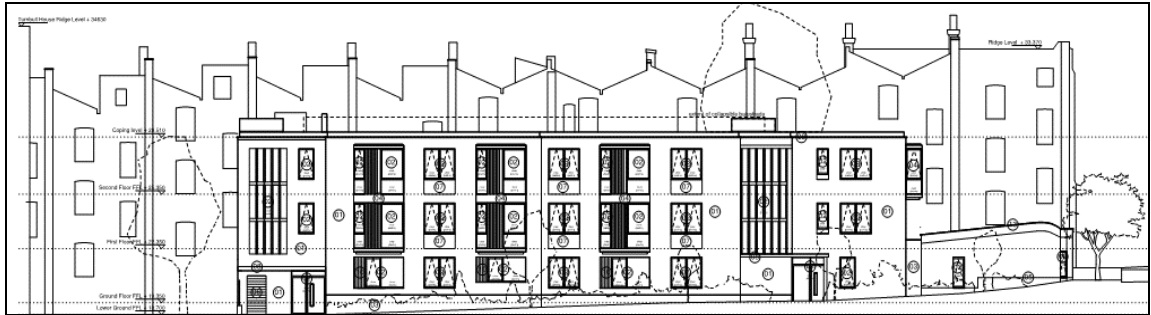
Front elevation of proposed building facing south from Windsor Street
